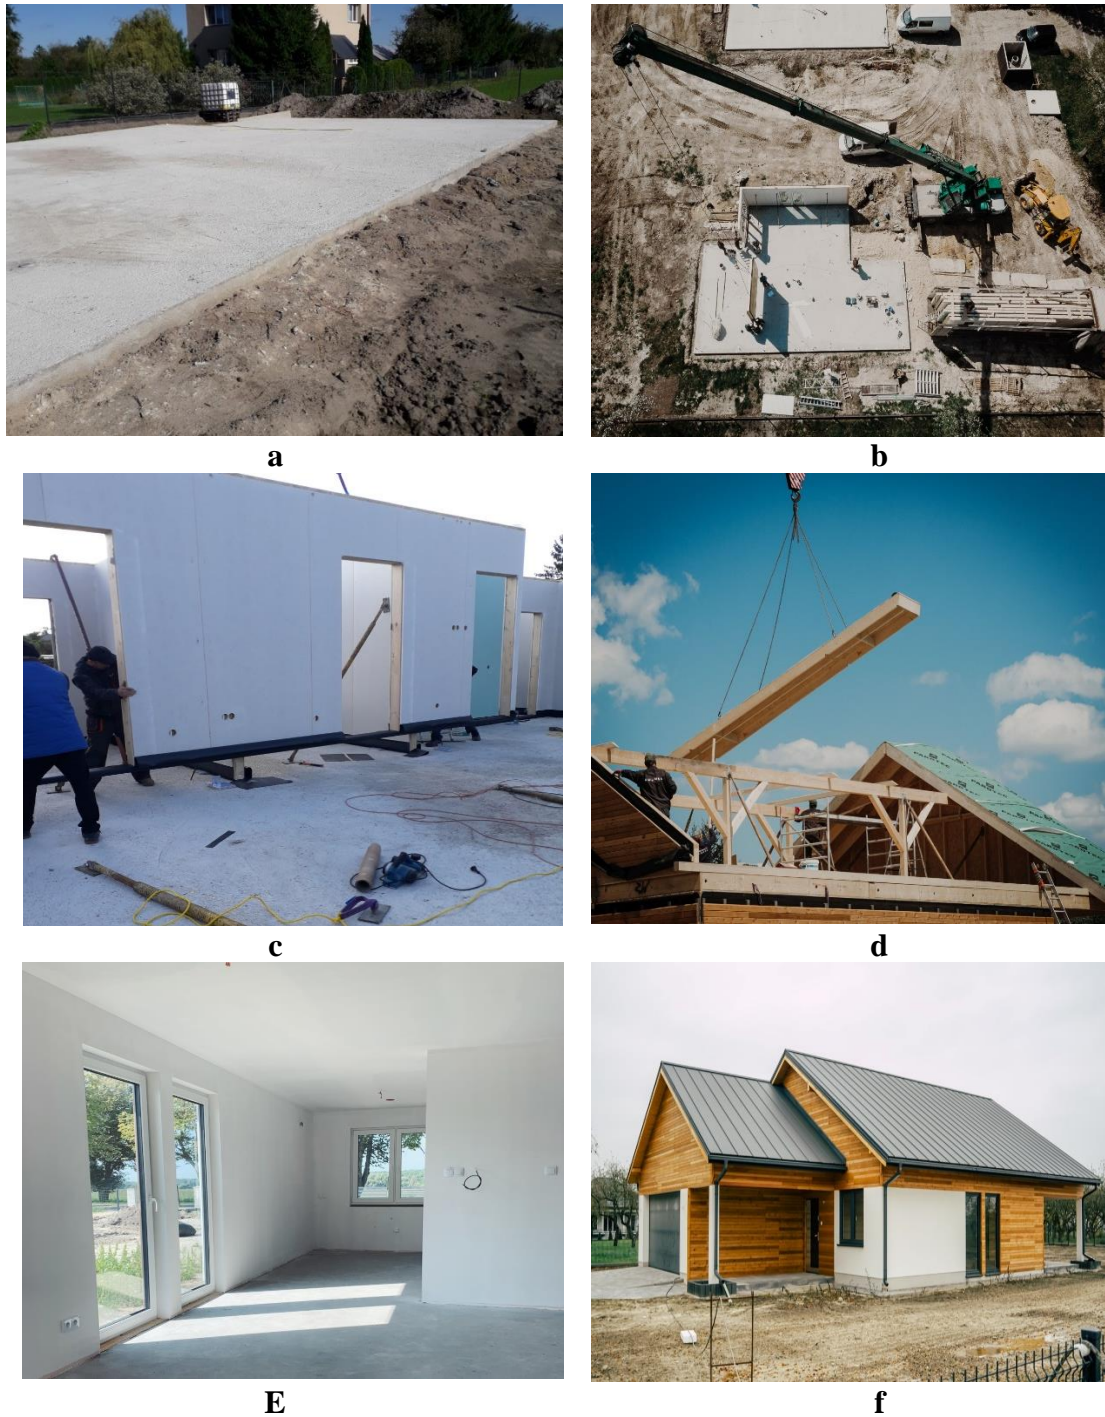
Production of prefabricates: a – finished foundation slab; b – process of module placement; c – installation of a prefabricated module; d – installation of a roof panel; e – view from the interior of a finished house; f – finished building constructed in the wooden modular structure technology.
